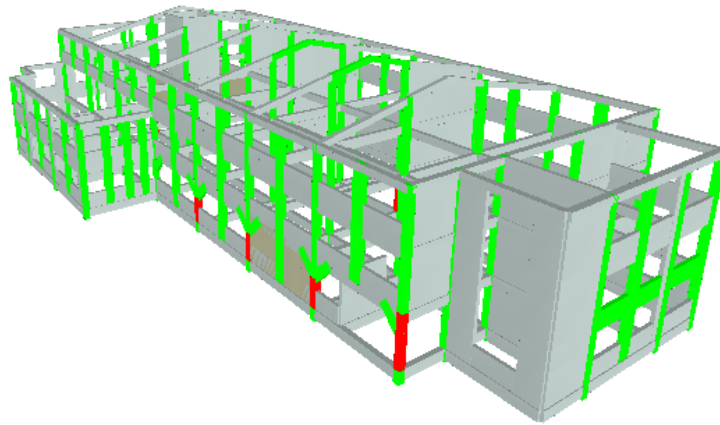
An Importance Level 4 Building showing damage at R=1.2 load level.
